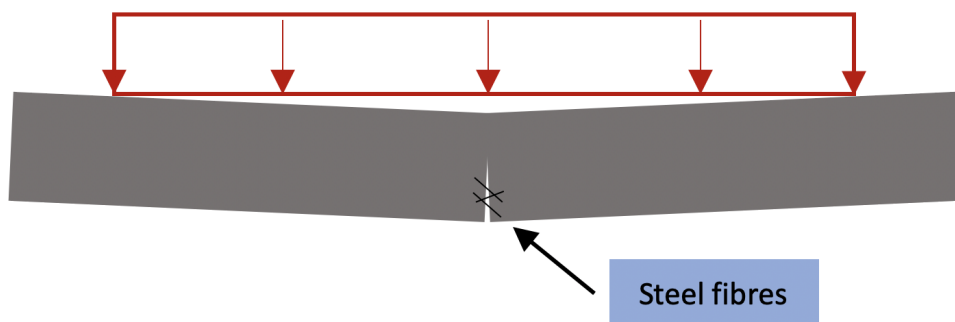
Schematic visualisation of the concept of bending where the steel fibres in the shotcrete mix counteracts cracking (author's own work).
